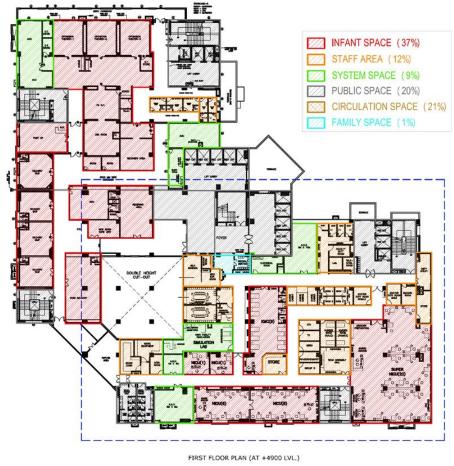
NICU Floor plan analysis - AIIMS, New Delhi. (Author)
